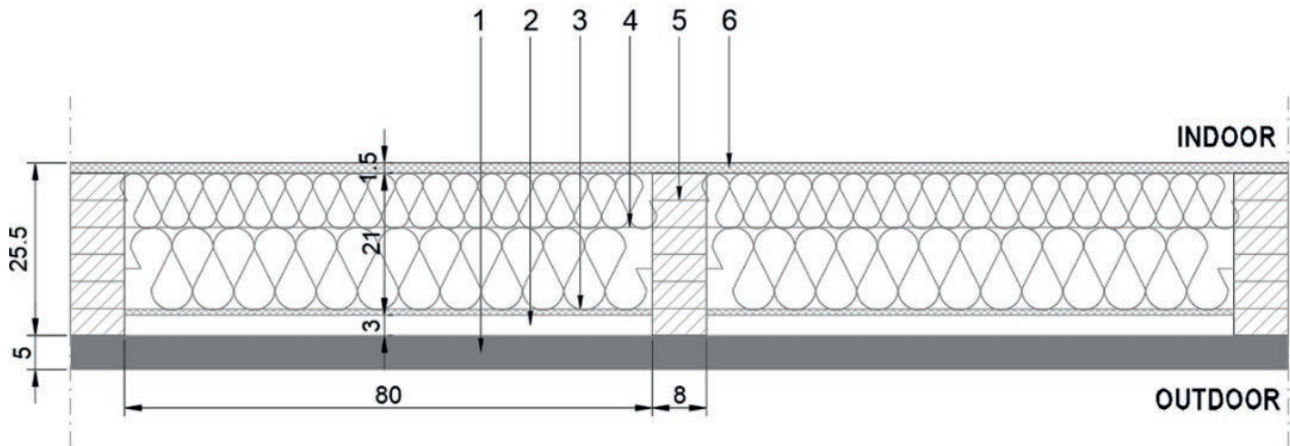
Horizontal section of the TCC façade studied (units in cm). The layers are: (1) reinforced concrete slab, (2) ventilated air cavity, (3) OSB panel, (4) rockwool insulation (100 kg/m³), (5) timber-frame structure, and (6) OSB panel. © Pastori S.
